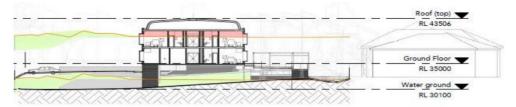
Section D with 8 metre projected existing ground plane (Source: Team 2 Architects)
